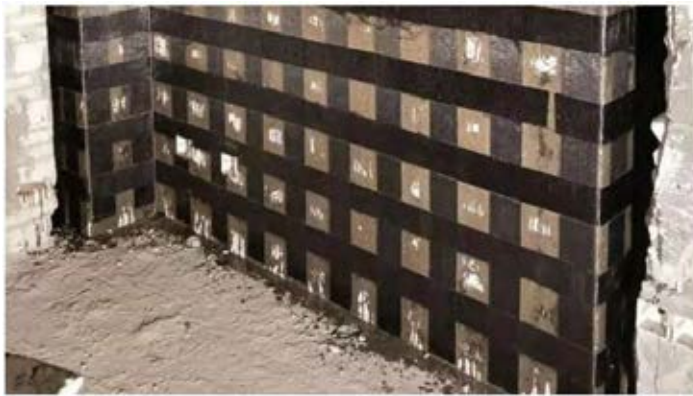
Example image of a concrete shear wall strengthened through the introduction of carbon fibre reinforcing in both vertical and horizontal directions. Image by Sheer Force Engineering.
